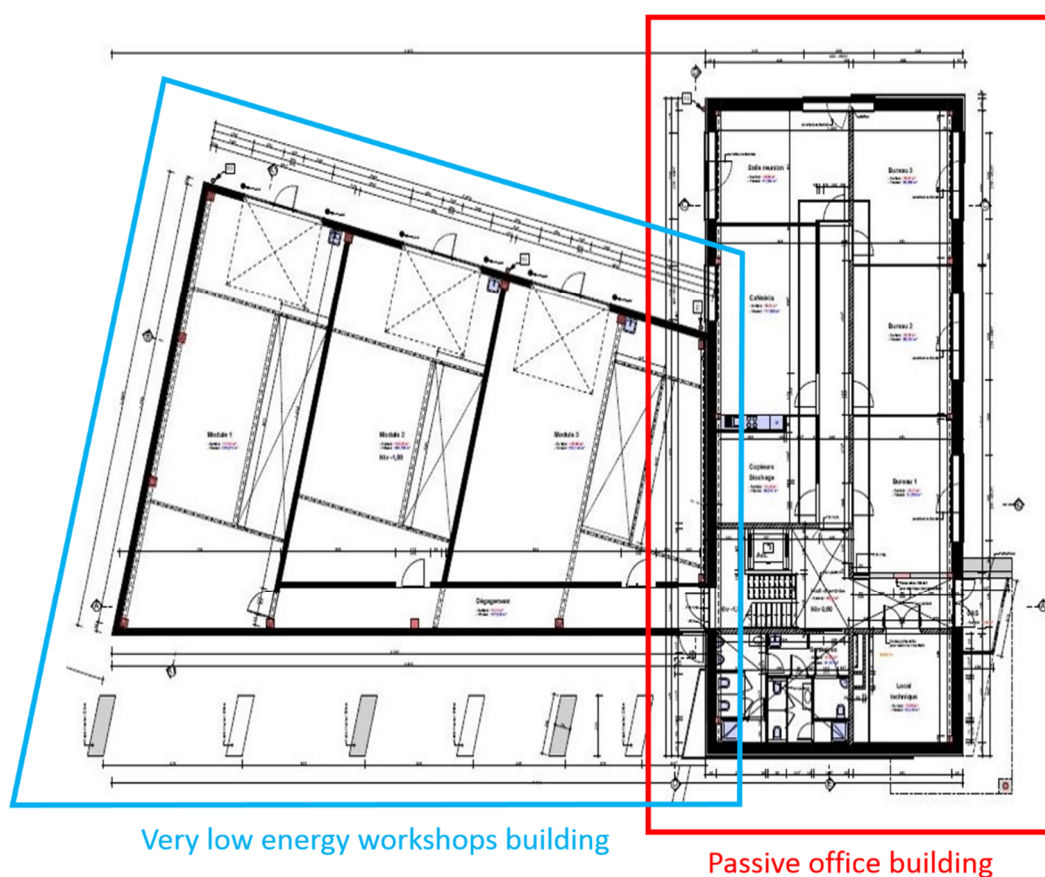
Ground floor plan of the REGAIN Belgian building.
